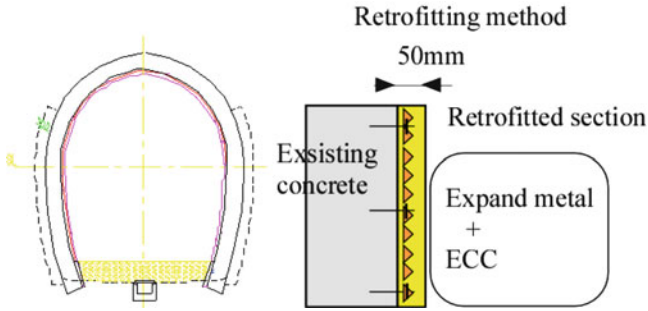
Tunnel liner reinforcing construction with R/ECC
